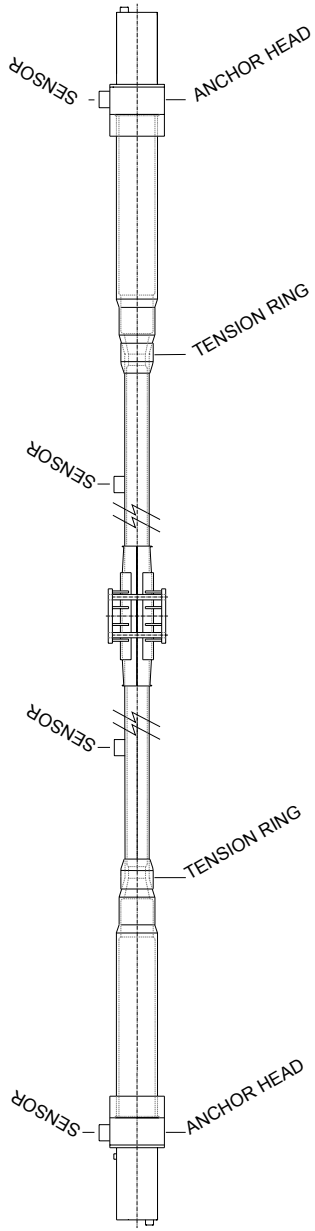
Placement of Soundprint sensors on a gouted specimen
